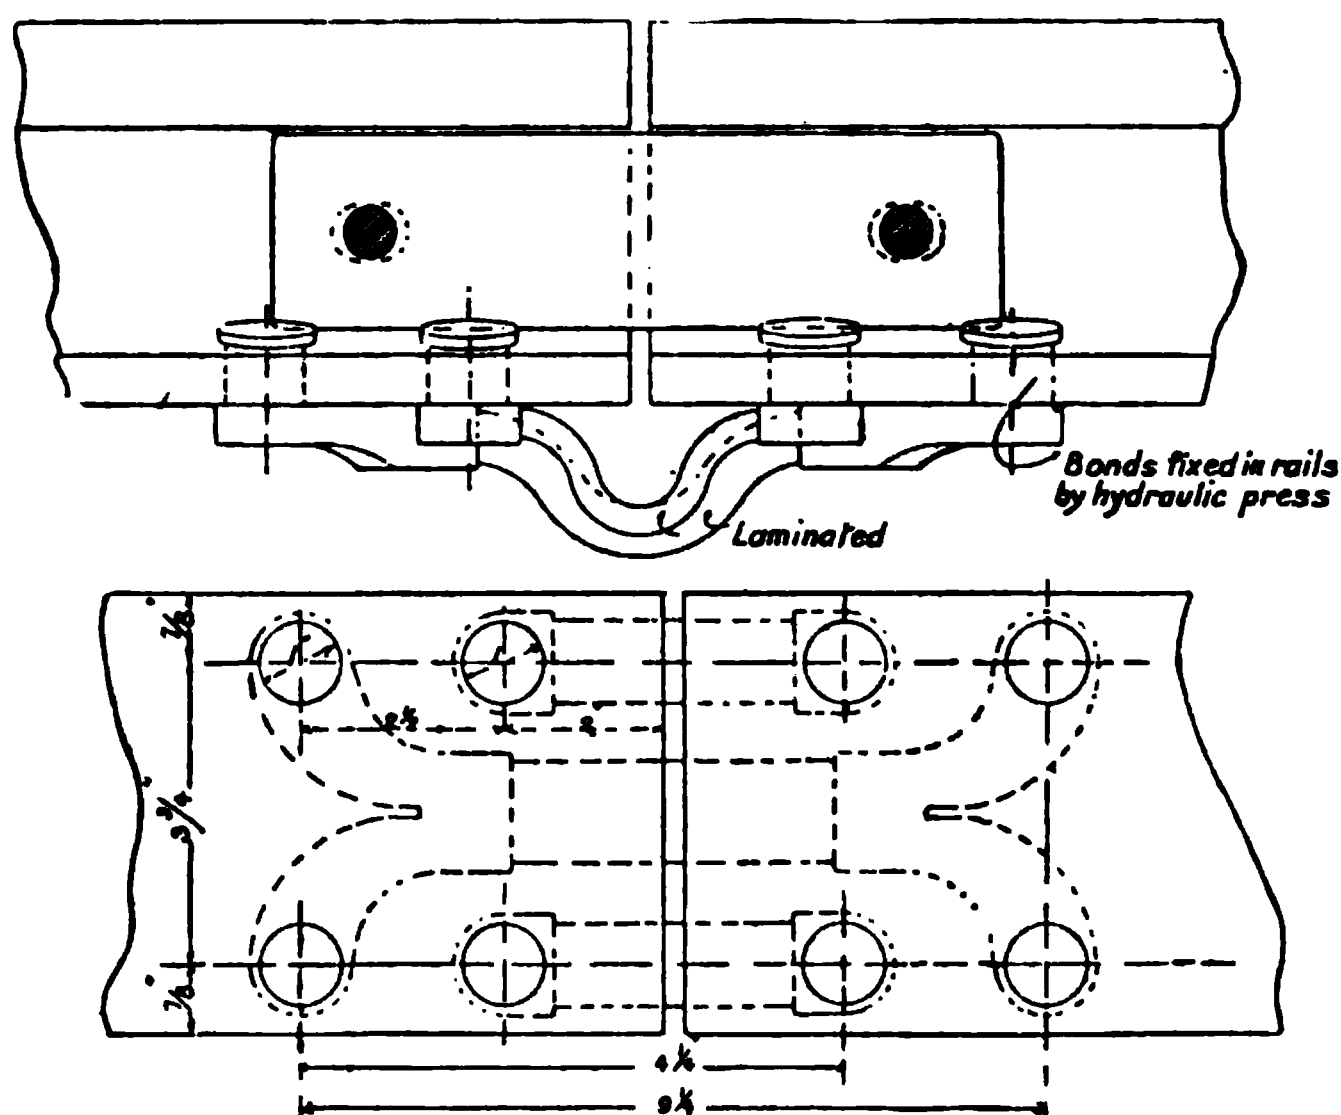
Elevation and Plan of Bonds of Conductor Rails.
